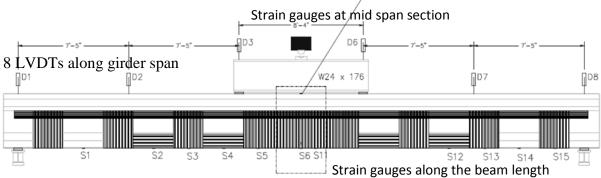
Static loading setup arrangement and gage placement locations for full-scaled AASHTO PSC girders
